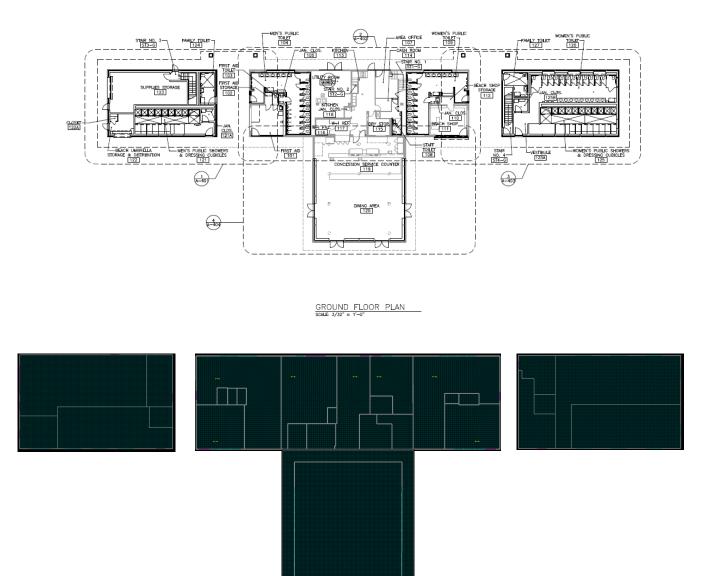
Field 5 Ground Floor Plan and Respective eQUEST Zones
